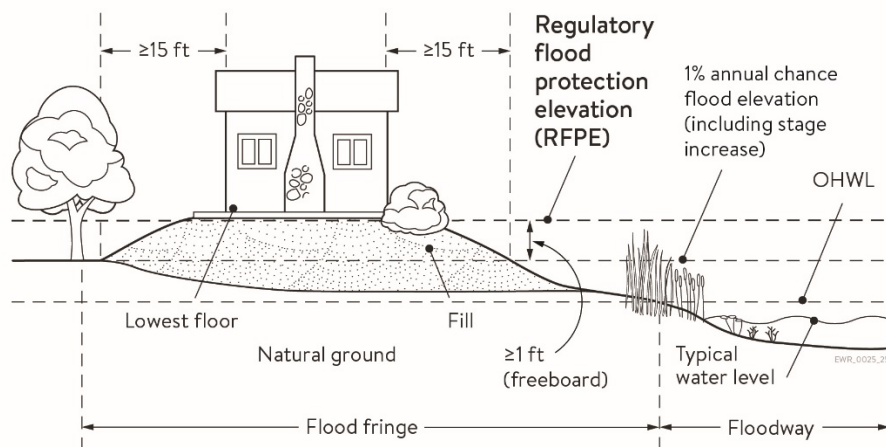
C-3: Overview of fill standards for residential structures.
